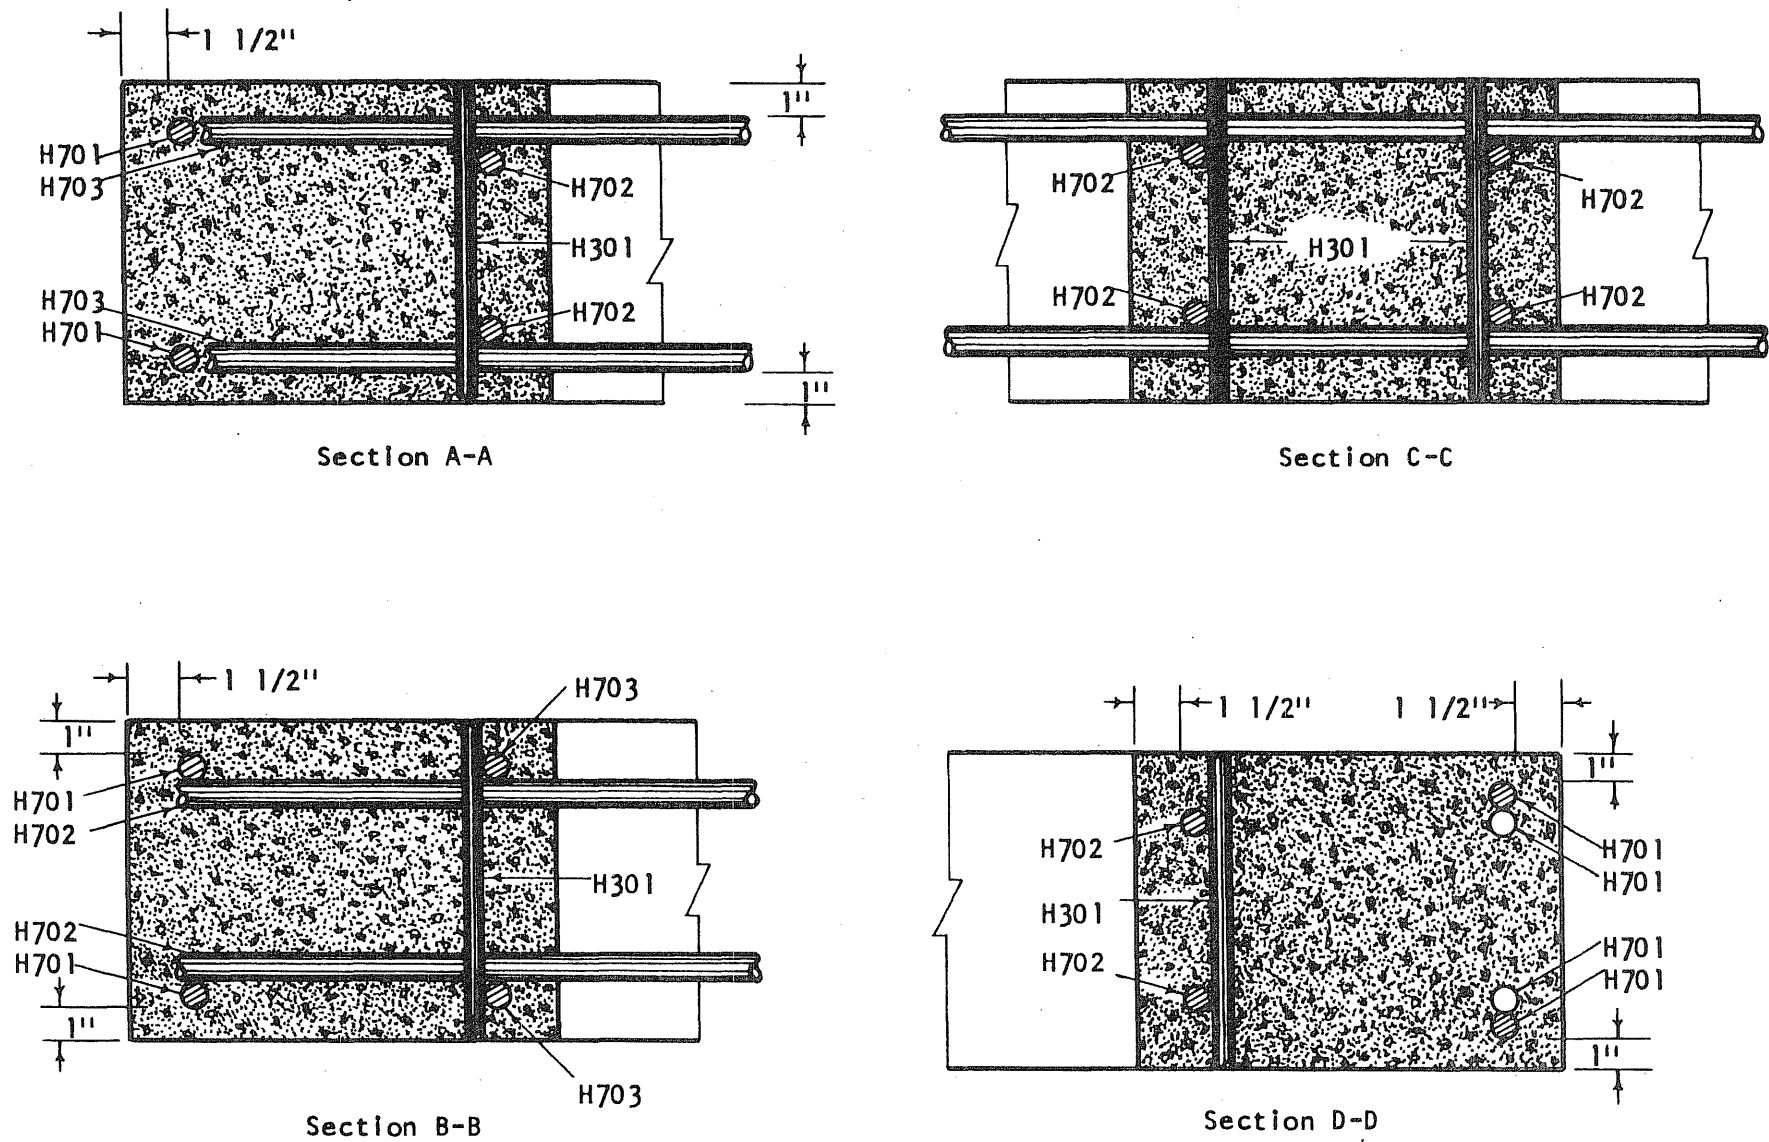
DETAILS OF REINFORCEMENT, SPECIMEN R1
